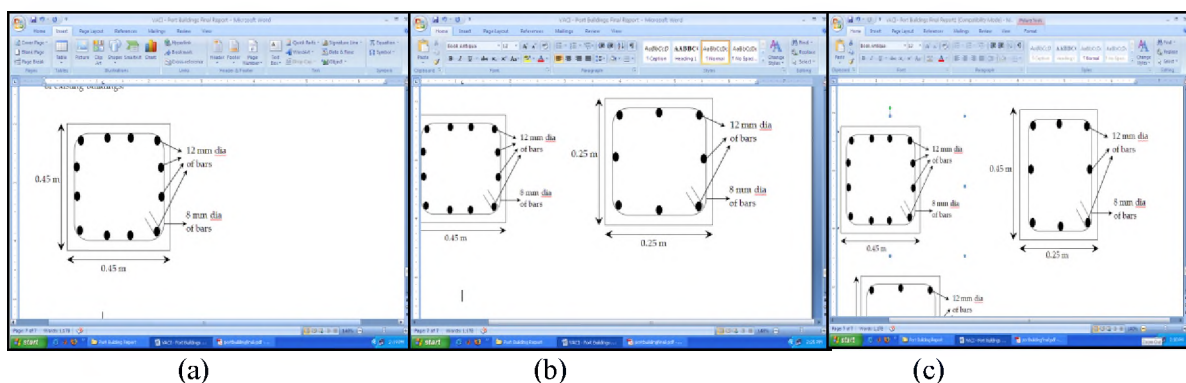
Reinforcement details for members (a) column-1 (b) column-2 and (c) beam
